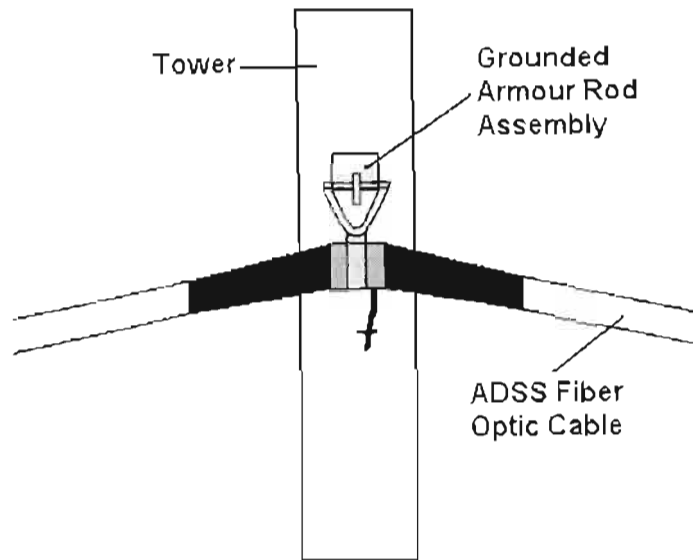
Grounded armour rod assembly supporting fibre optic cable at tower. Redrawn from [Karady et al, 2000]
